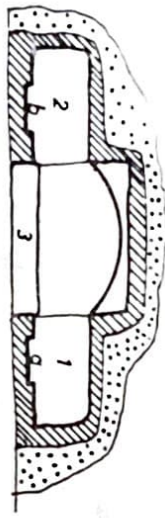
Plan and Sections of Tomb A - Saif Hussein - (شكر)
